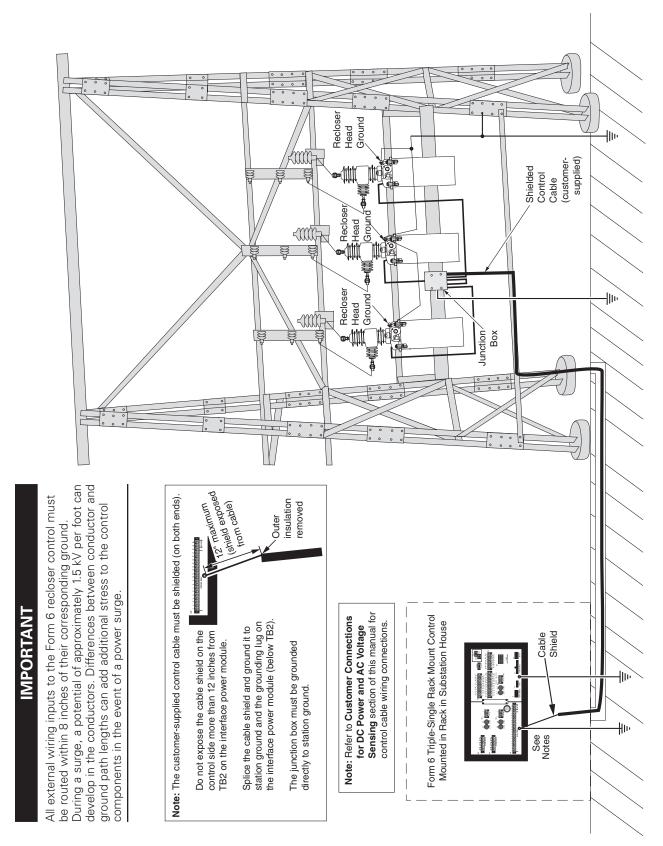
Grounding connections for a Form 6-TS rack mount control installed in a substation
